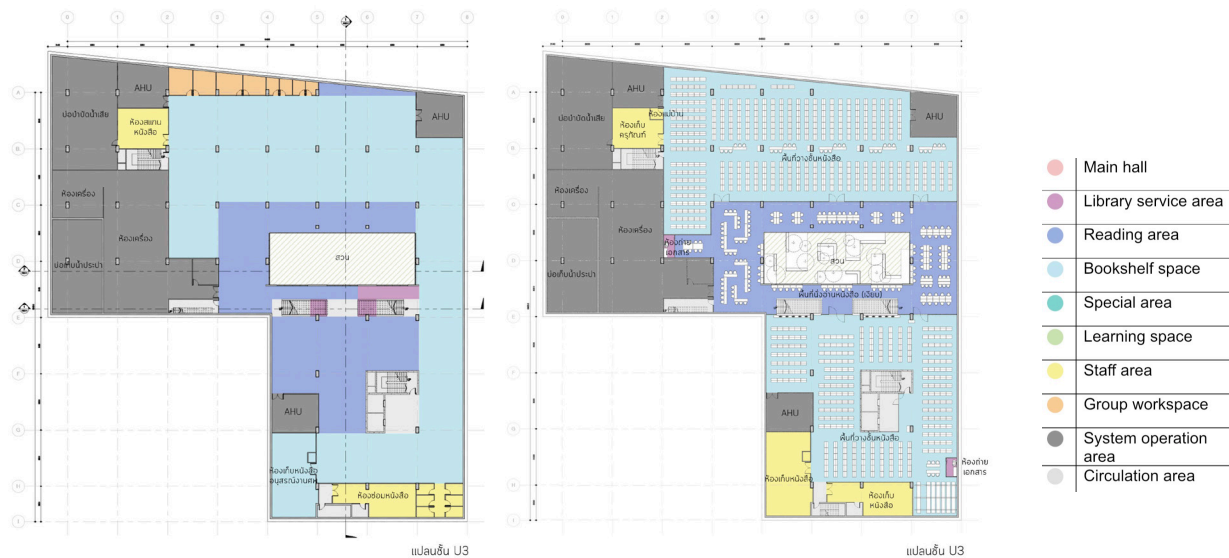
Comparison of U3 floor (left) Current plan and (right) New plan.
